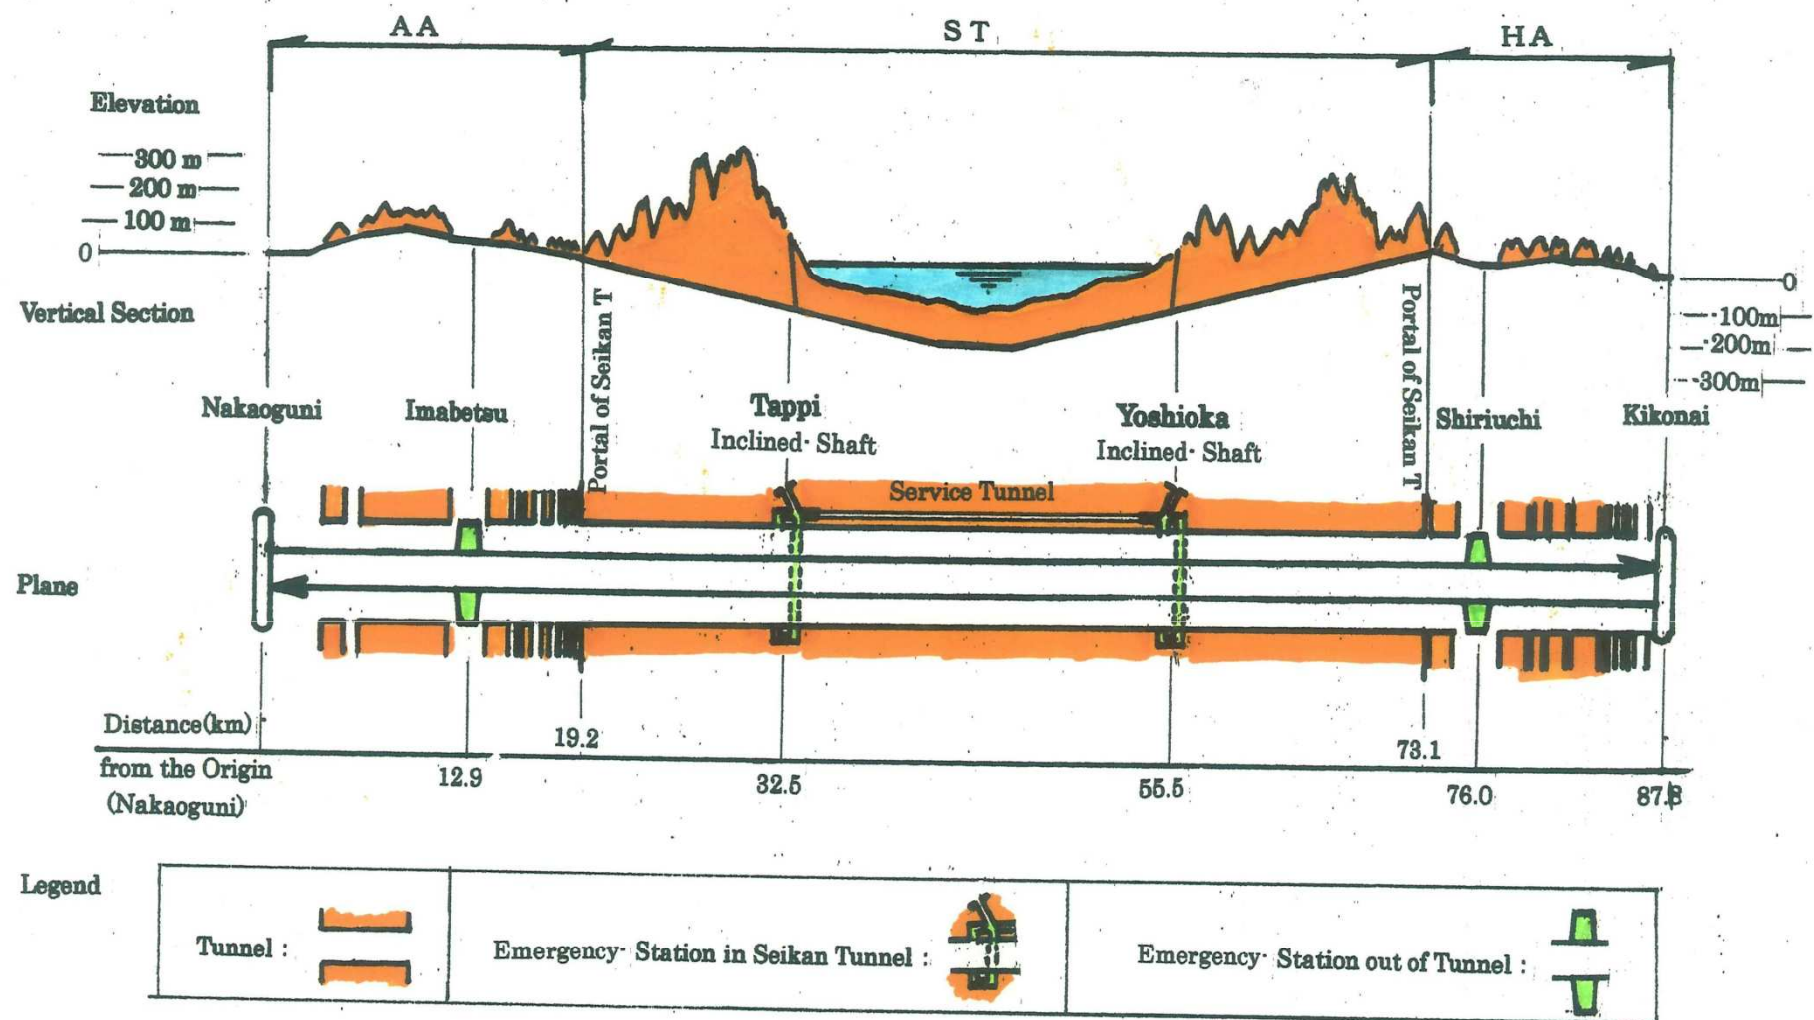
Arrangement of Tunnels and Emergency Station in Tsugaru Straits Line.
